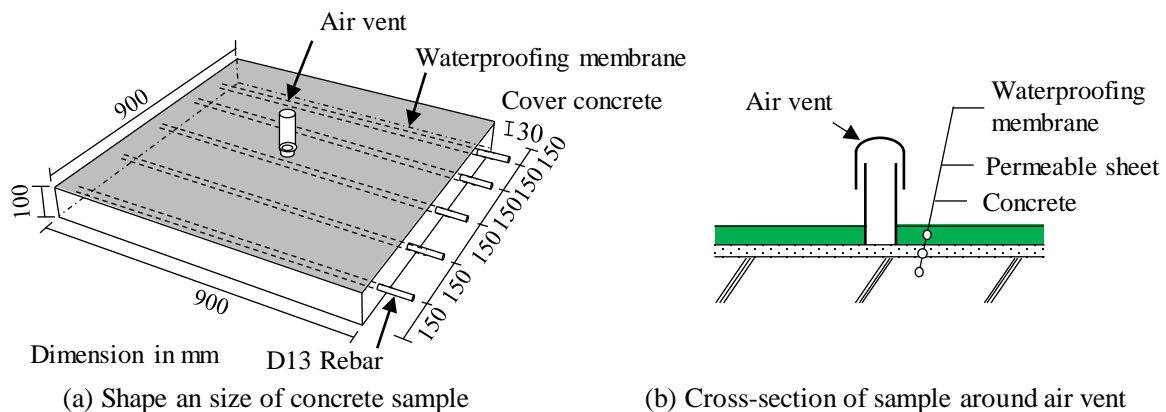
Sample of corrosion performance tests for reinforcing steel bar in Concrete
